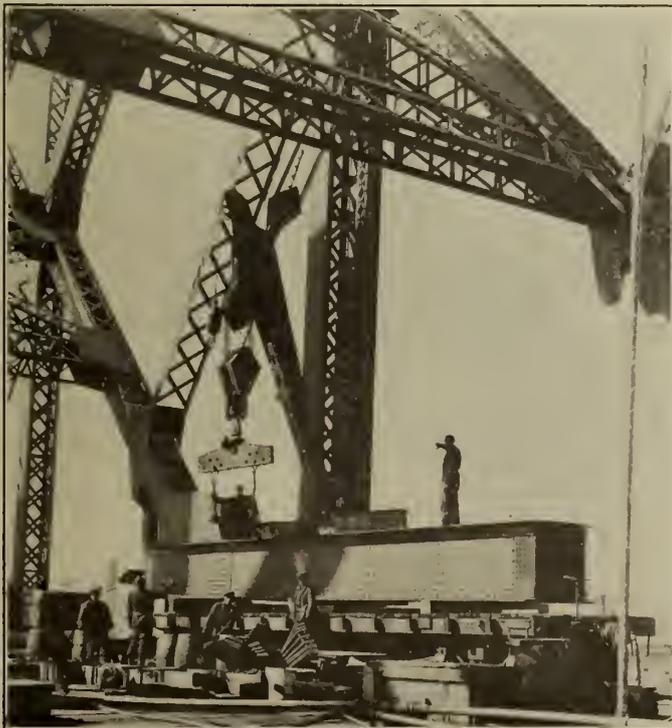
Main Span, North Side—Arrangement of hoisting Derricks at AL13.
